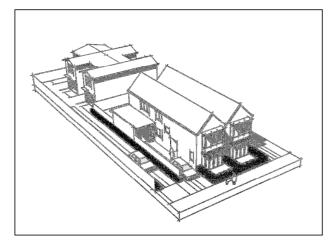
Defined public fronts and clear sense of address Maximising doors and windows on the front façade of a dwelling
